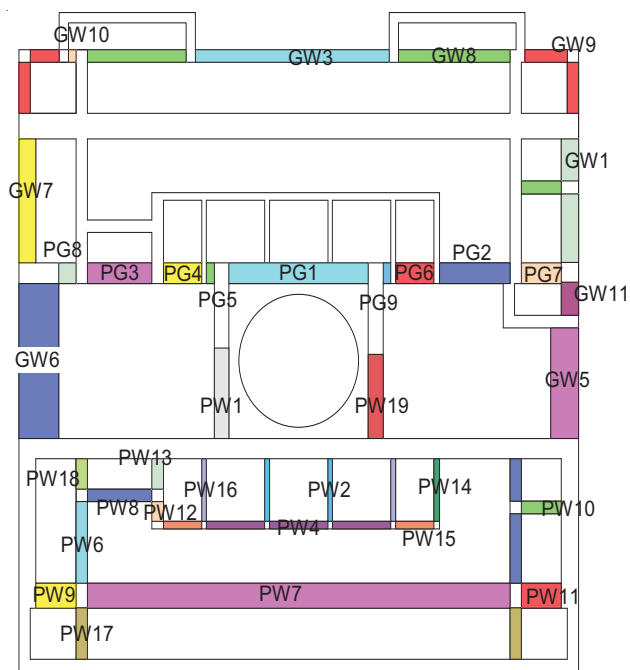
G.5-15. RB Upper Pools - Wall Sections for Heat Transfer Calculation
